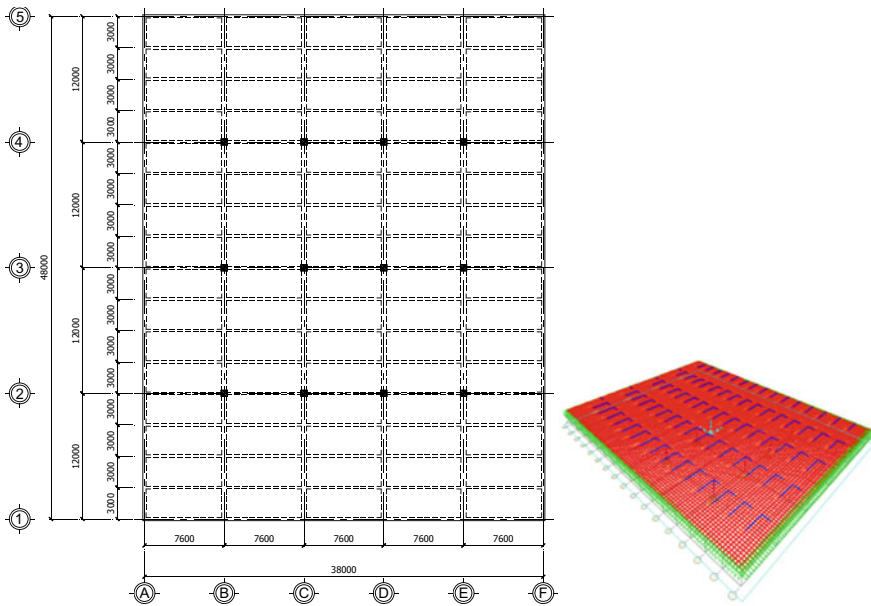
The floor plan and three-dimensional slab is modelled using SAP2000
